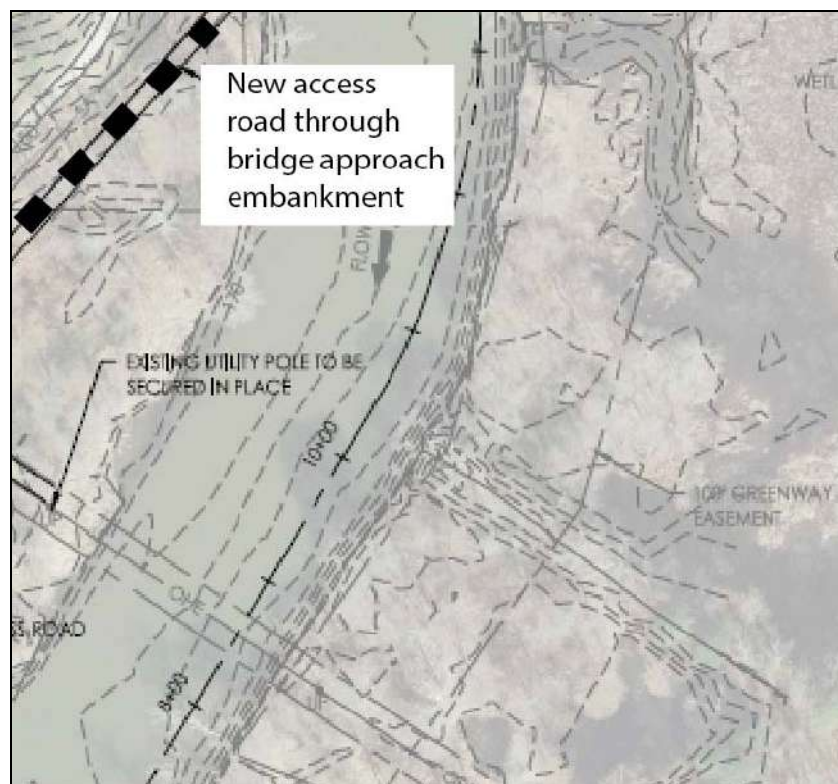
Proposed Undertaking – Phase 1 Access – bridge approach embankment at 31WA1873.
